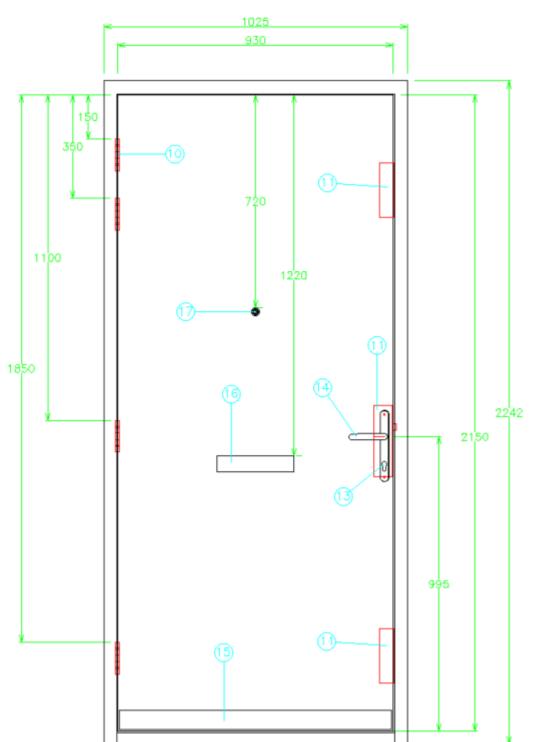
General Elevation of the Test Construction, Thermocouple Locations and Opening Direction
